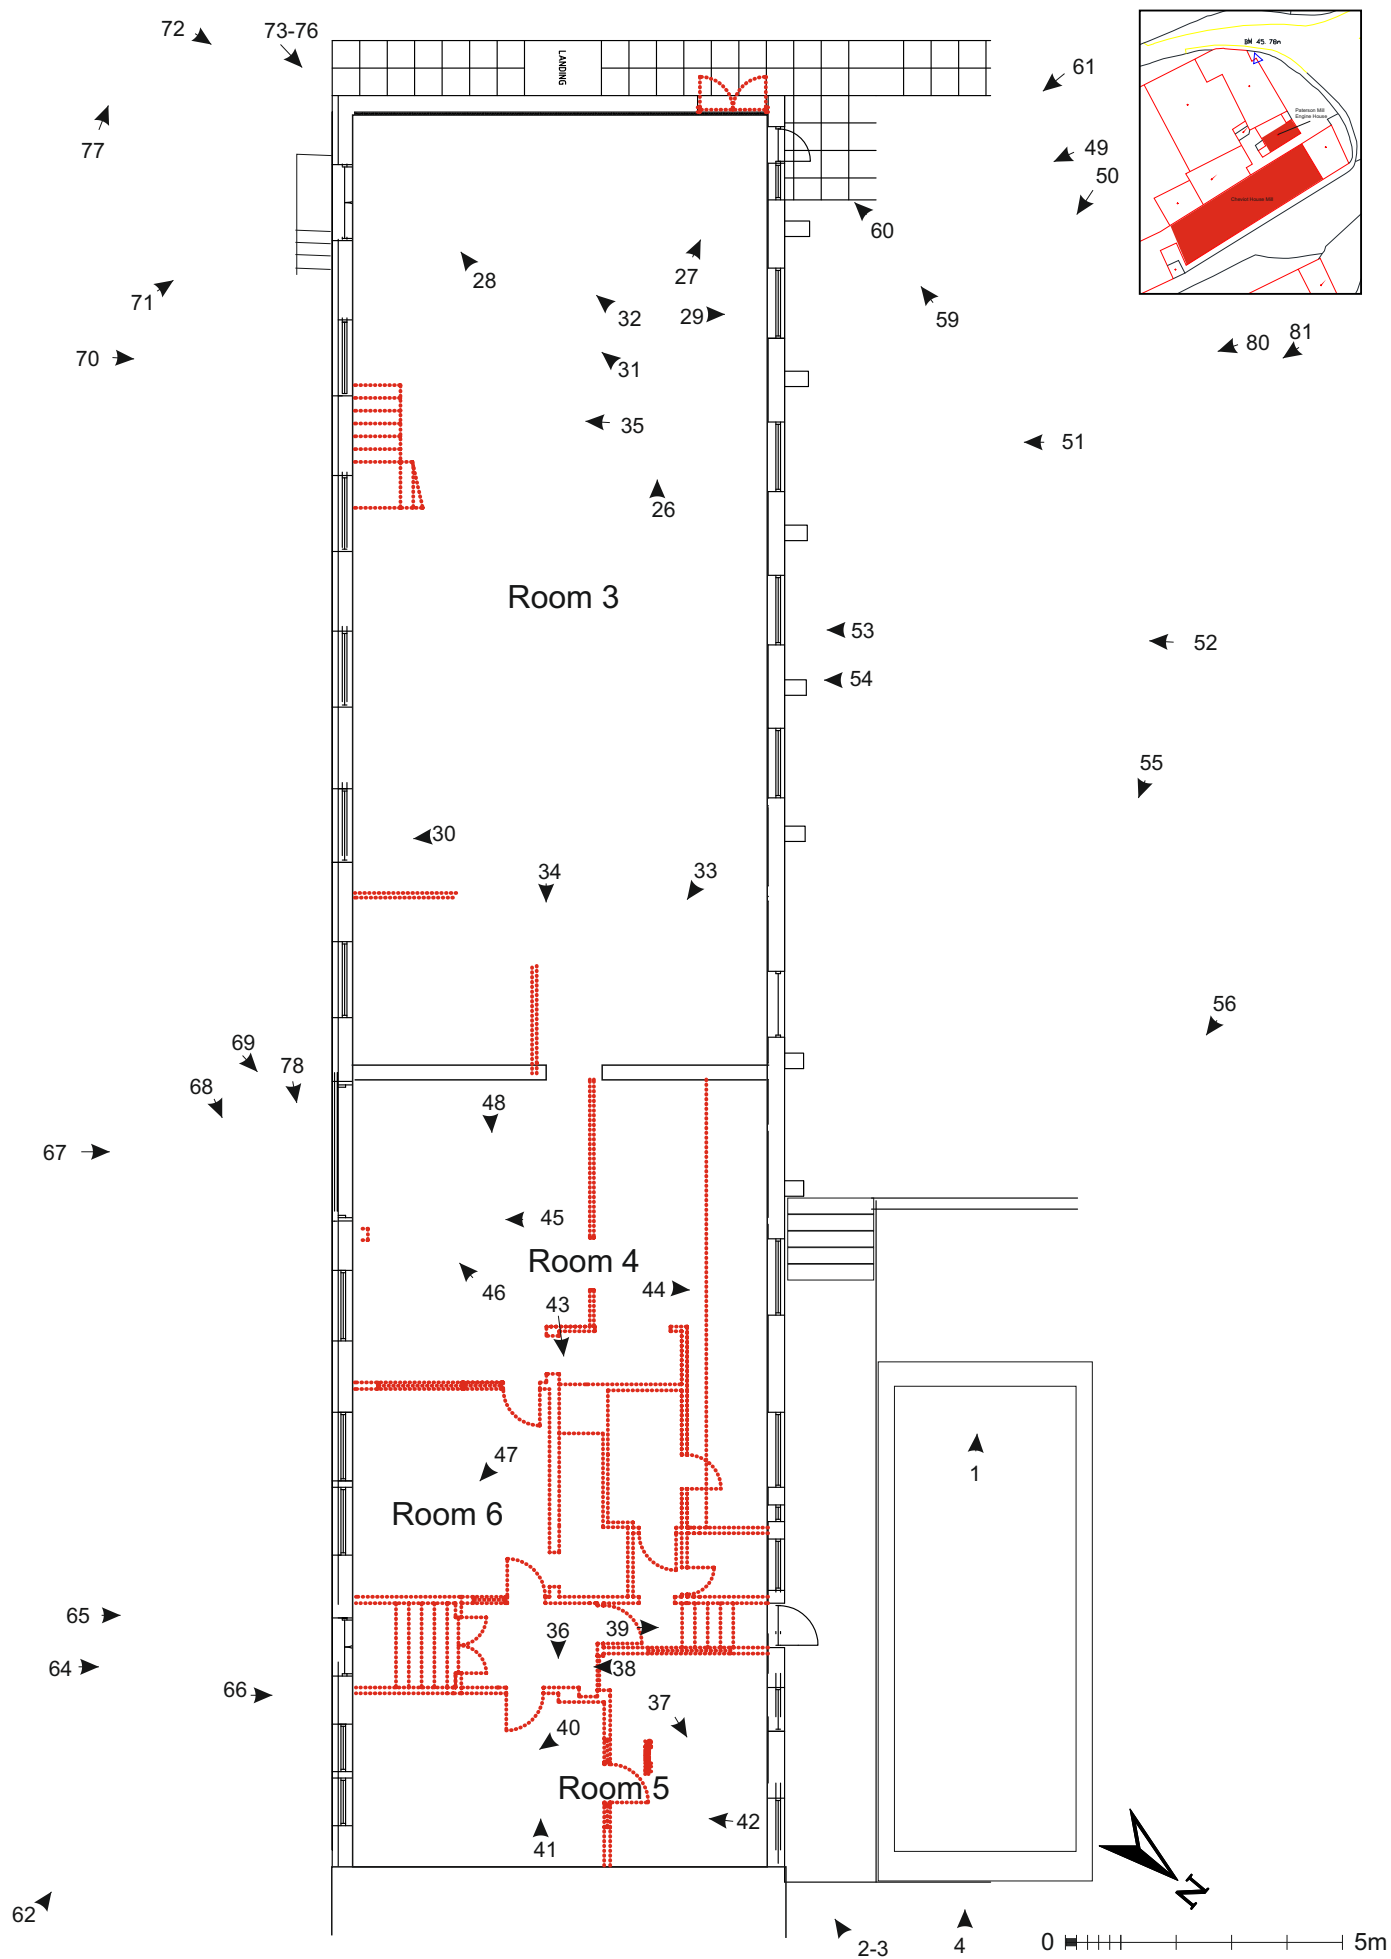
Ground Floor plan (with interior partitions) and photographic index
